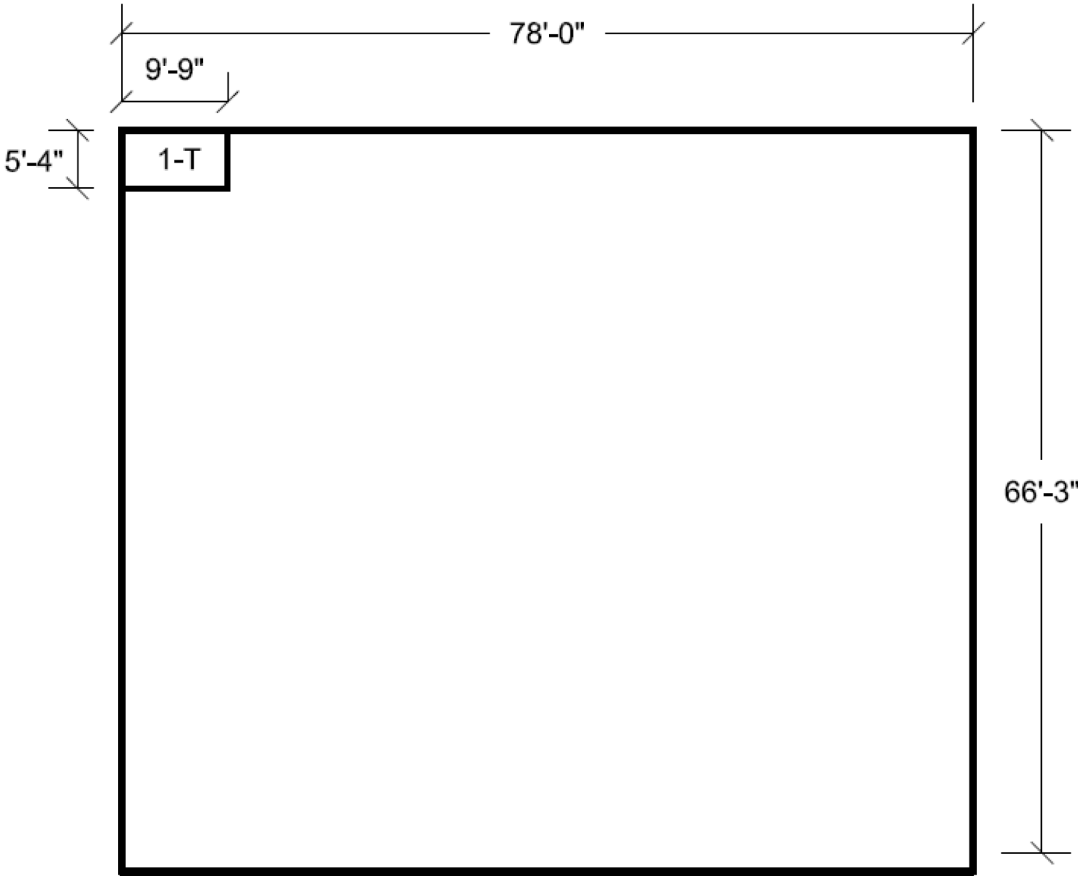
H.6-74A Pump House Internal East Wall Looking West Transverse Reinforcement Zones
